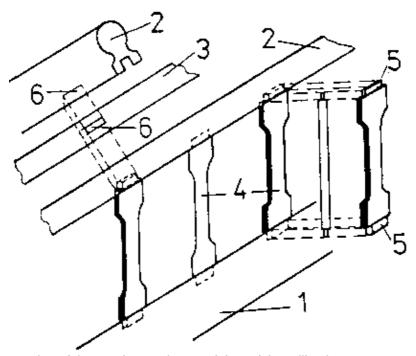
Representation of the mortise–and–tenon joints of the railing bars – 1 outer string, 2 hand–rail, 3 underside of the handrail, 4 railing bar (profiled), 5 tenon of the railing bar, 6 mortise in the hand–rail
